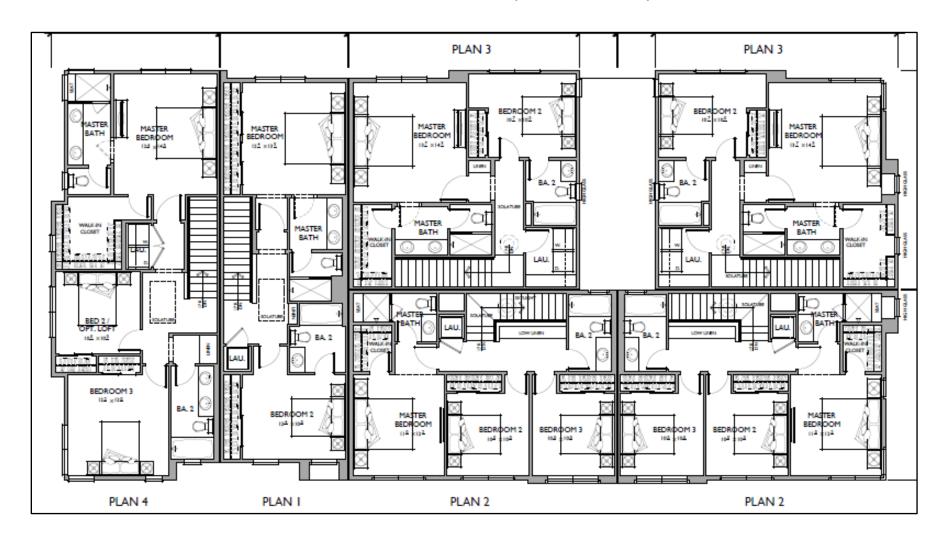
<sup>ST</sup> FLOOR PLAN (6-PLEX TYPICAL)
